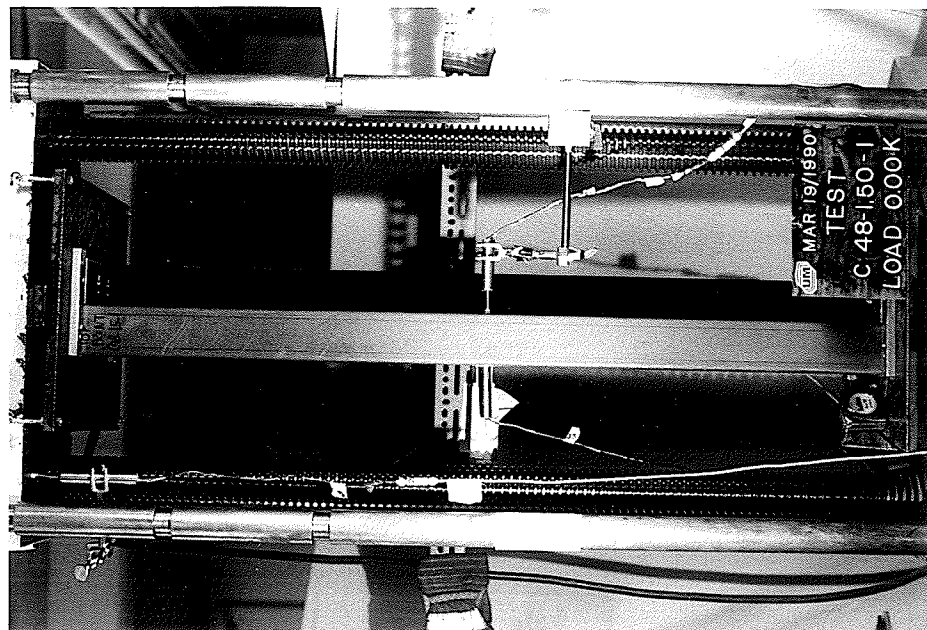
The Test Set-Up for a Typical Column Specimen
